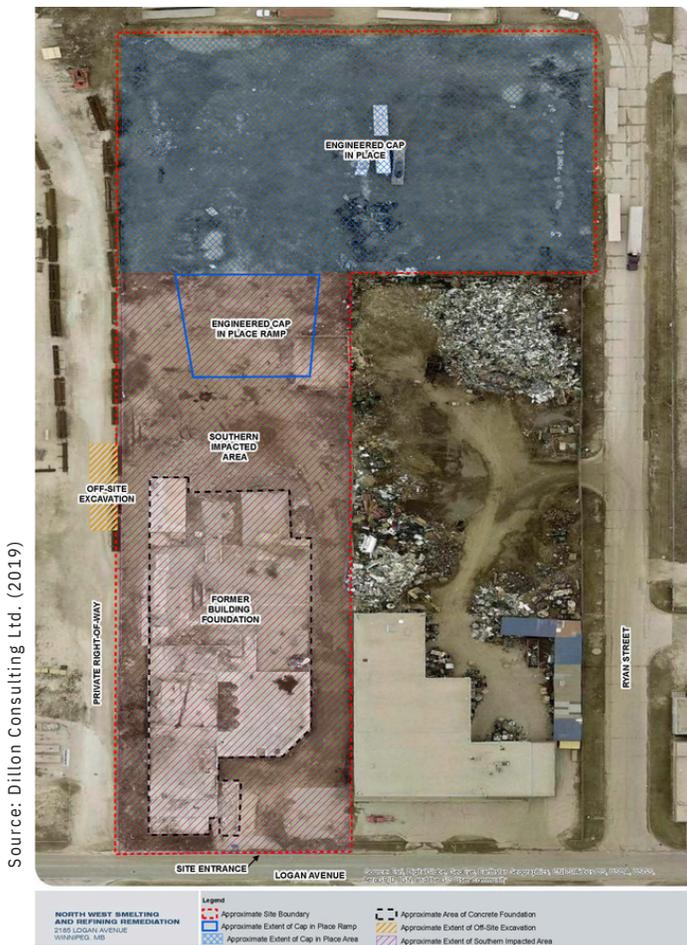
Site plan illustrating the remediation process, including the removal of former building foundations and contaminated soil in the southern portion of the site, and the construction of an elevated engineered cap in the northern portion, where much of the excavated soil was consolidated beneath using risk management techniques.
